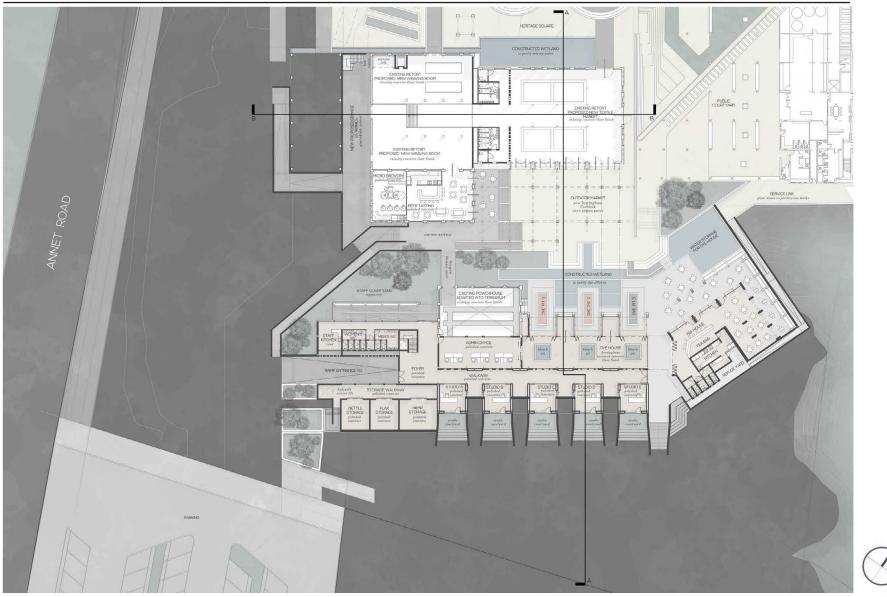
Final design Ground Floor Plan (Author 2017)
